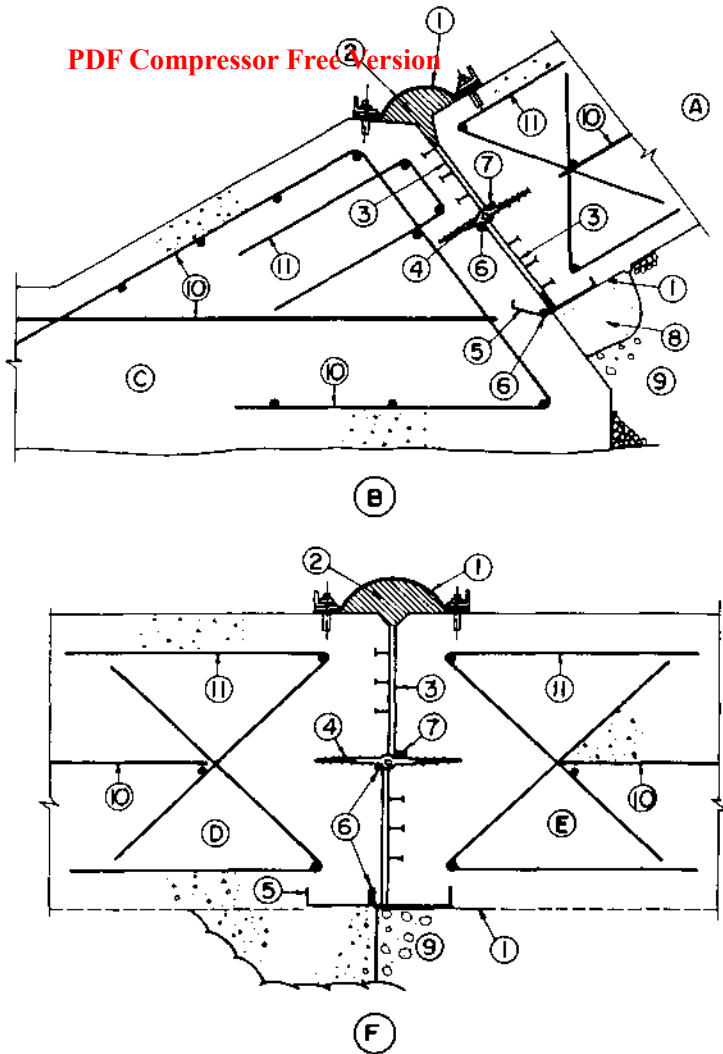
Salvajina Dam perimeter and near abutment vertical joints (ICOLD 1989a). (1) Hypalon band, (2) Mastic filler, (3) Compressible wood filler, (4) PVC waterstop, (5) Copper waterstop, (6) Neoprene cylinder, (7) Styrofoam filler, (8) Sand-asphalt mixture, (9) Zone 2, (10) Steel reinforcement, (11) Steel reinforcement to protect concrete against crushing and to protect waterstop. (A) Face slab, (B) Perimetric joint, (C) Toe slab, (D) Toe slab, (E) Face slab, (F) Abutments.
